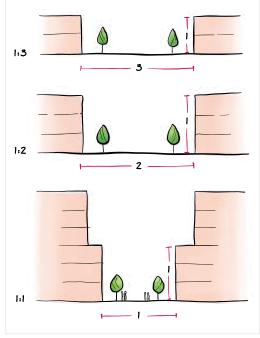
Illustrating different building height to street width ratios (3.1.2. h).
